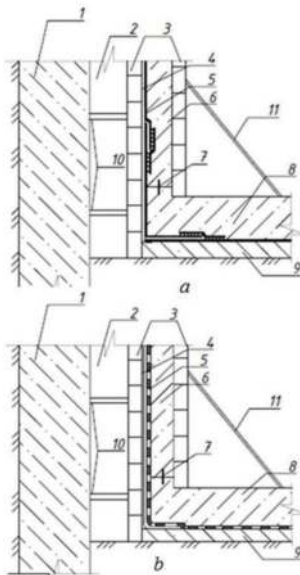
Waterproofing of structures with slots for backfilling: *a* – waterproofing coating from factory ready rolls; *b* – waterproofing coating from sprayed compositions; 1 – excavation fence; 2 – slots; 3 – external and internal formwork boards; 4 – geotextile fabric substrate; 5 – waterproofing coating; 6 – monolithic wall structure; 7 – hydrotrench; 8 – tray slab; 9 – base concrete; 10 – tele-scope spindles; 11 – frame for one-sided concreting.
